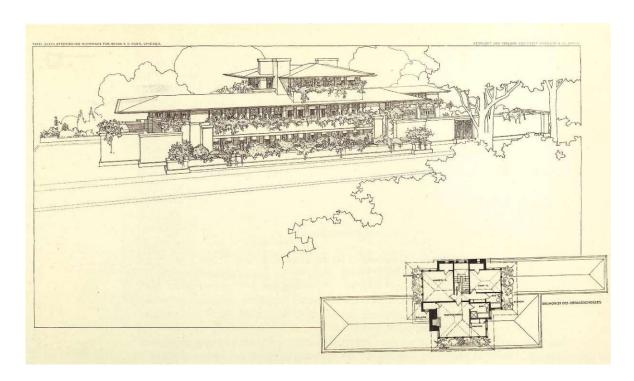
Frank Lloyd Wright, Residential building Robie in Chicago, perspective and floorplan, 1908
